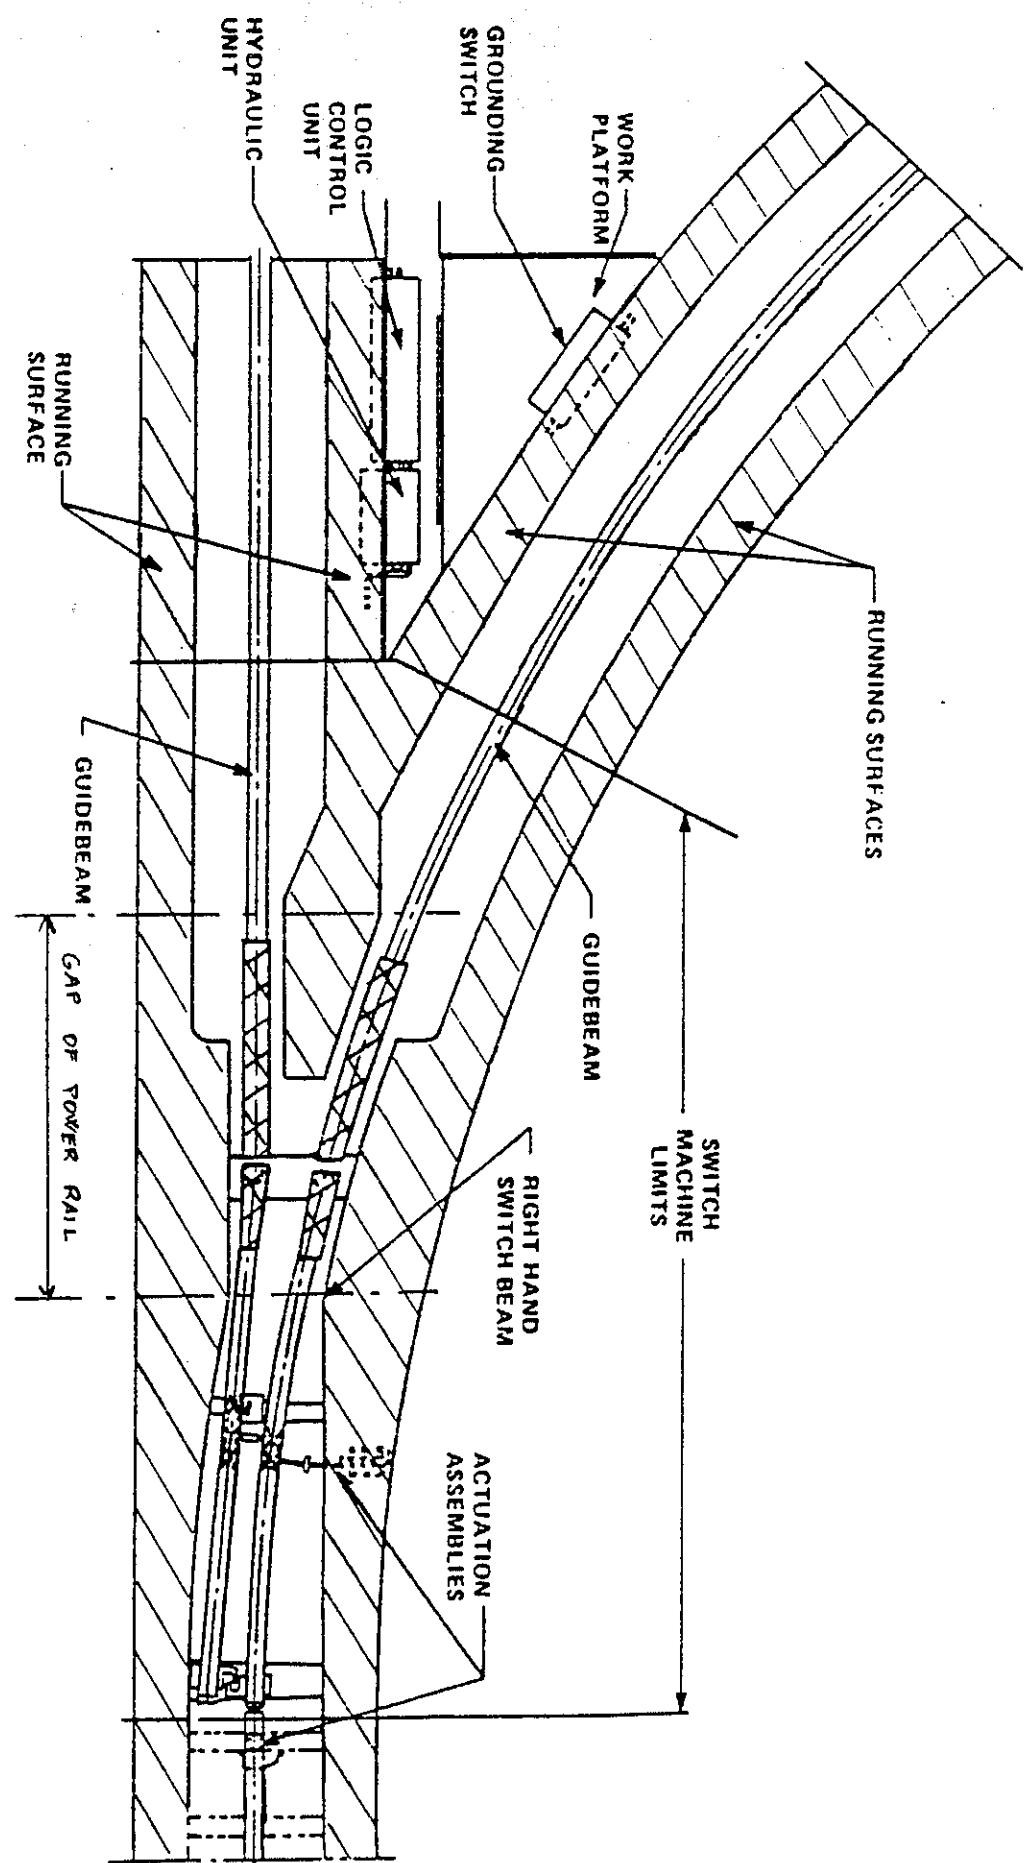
PIVOTING SWITCH PLAN - TURNOUT POSITION
